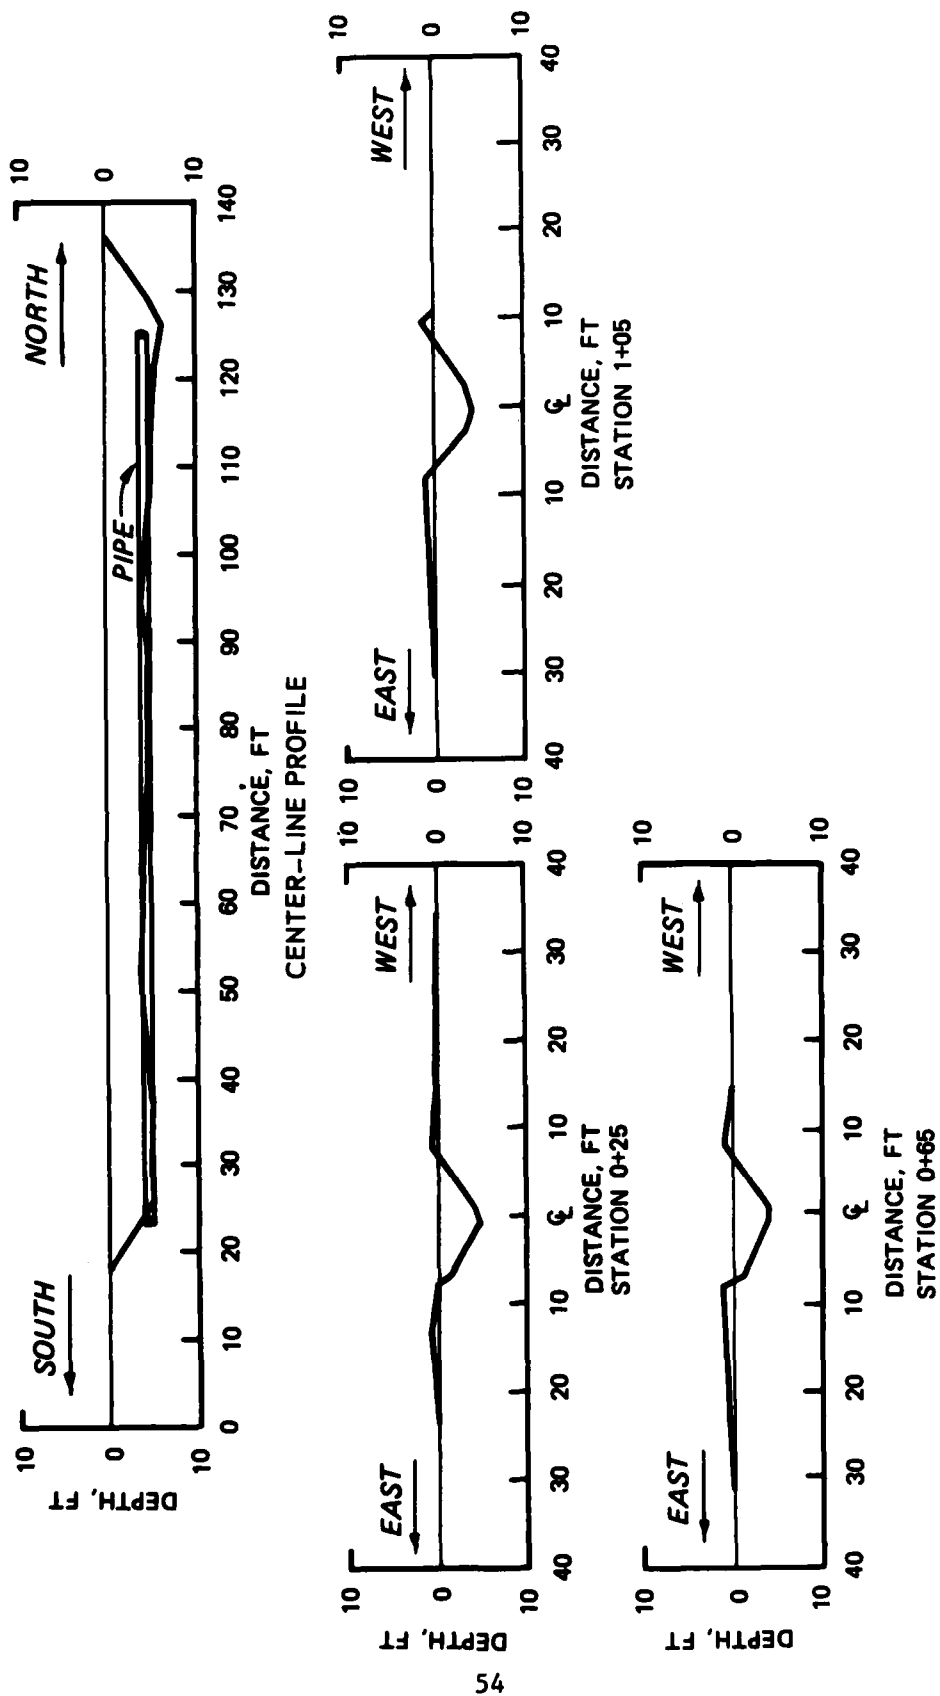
Shot 6SR4A (100-ft pipe primed with detonating cord),
